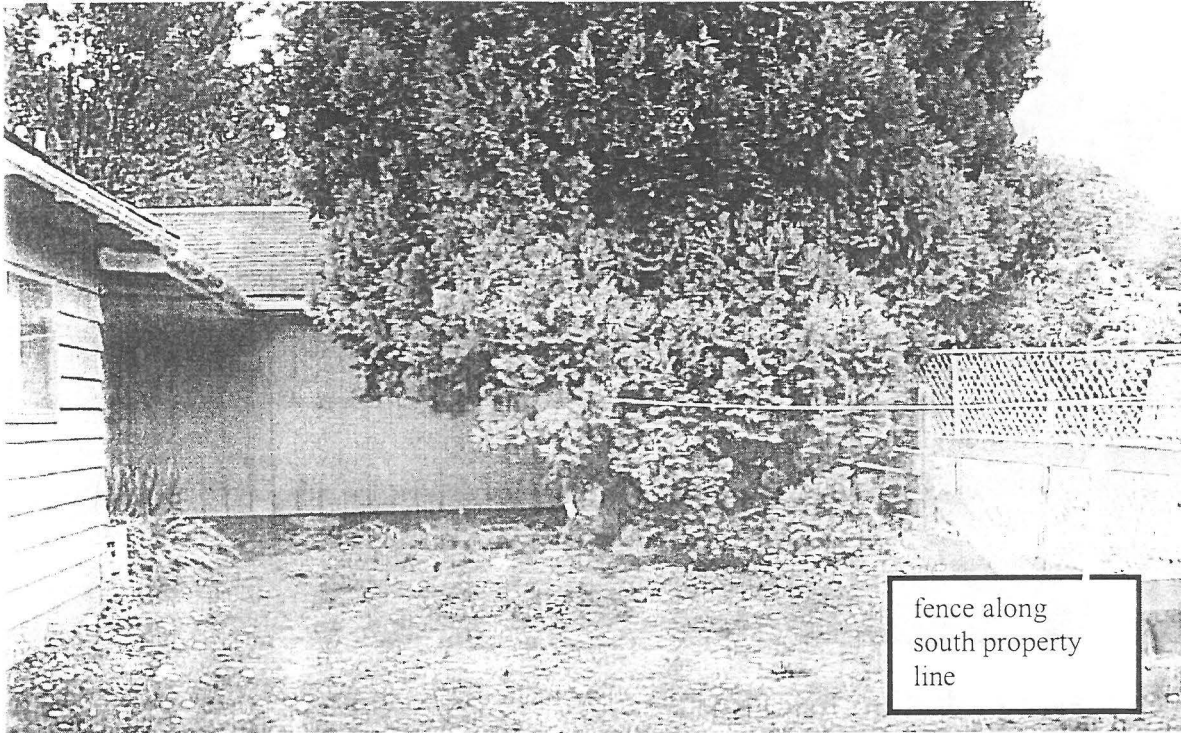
View of structures on adjoining lots from southwest corner of the house.
